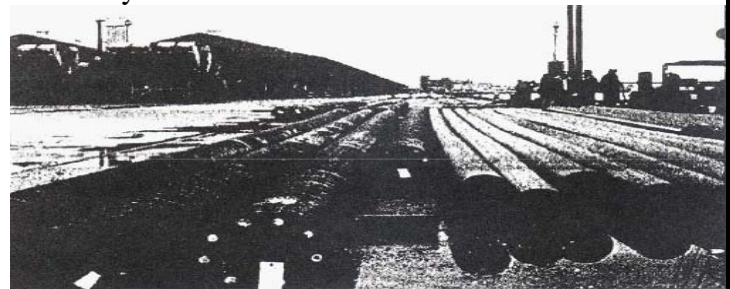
Structurally Reinforced Matrix Piling on Left and Fiber Reinforced Plastic Piling on Right.
